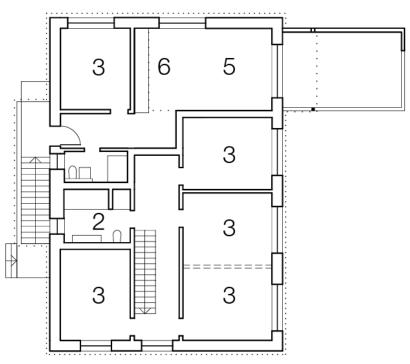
First floor plan of the Residential House, CH, scale 1:500, 2 Bathroom 3 Room 5 Dining areas 6 Kitchen (Voss et al., 2013)
